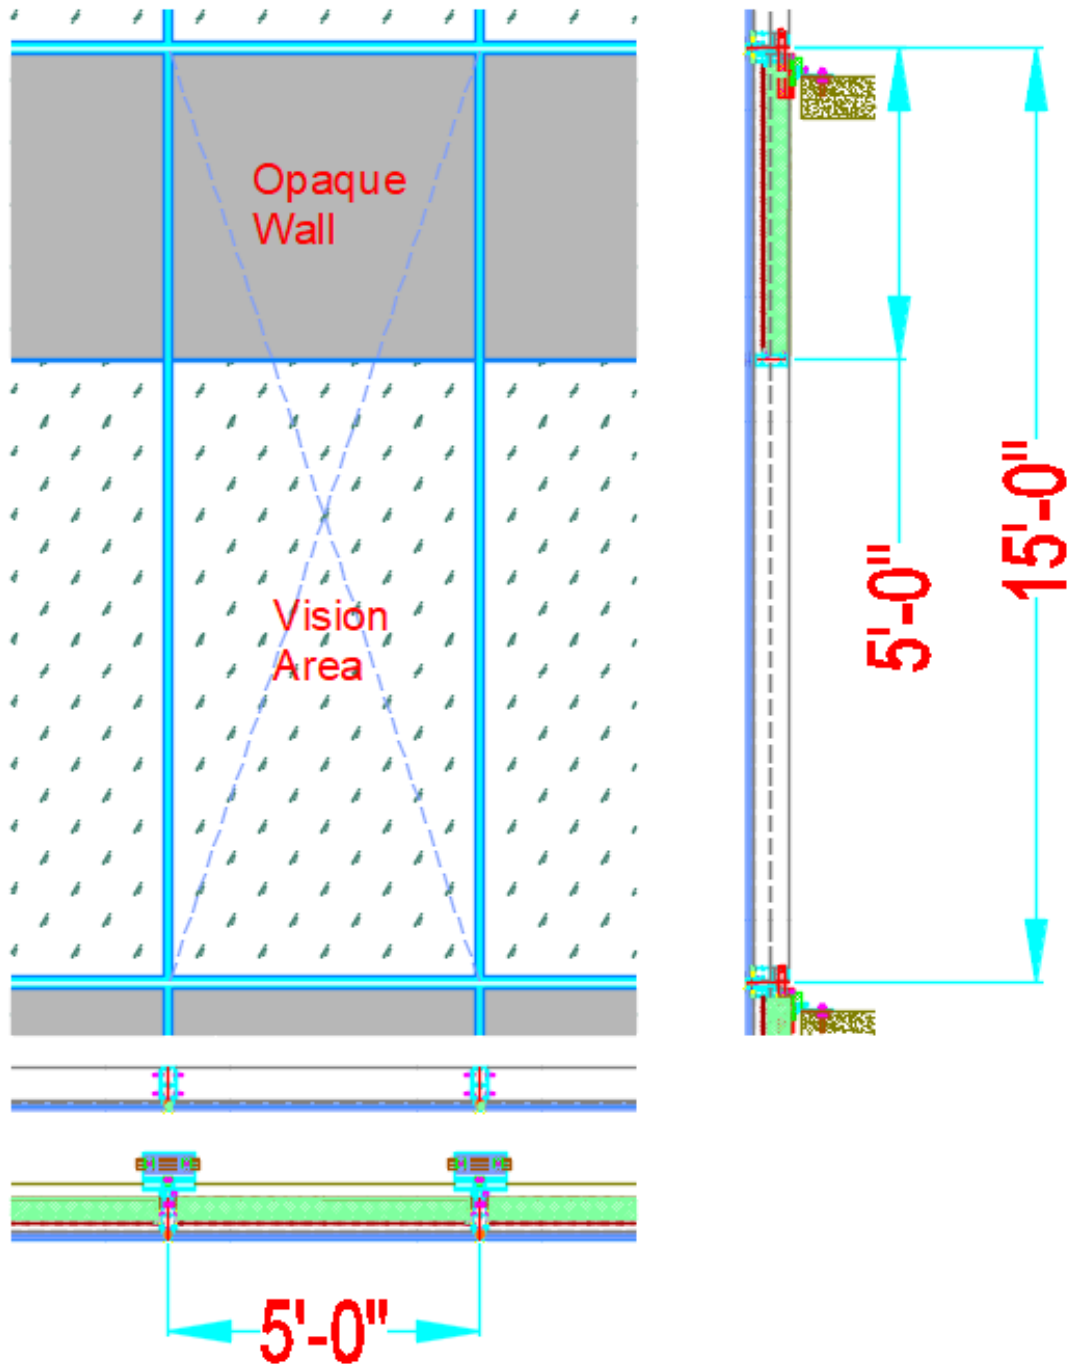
Curtain Wall Unit Elevation and Dimensions.
